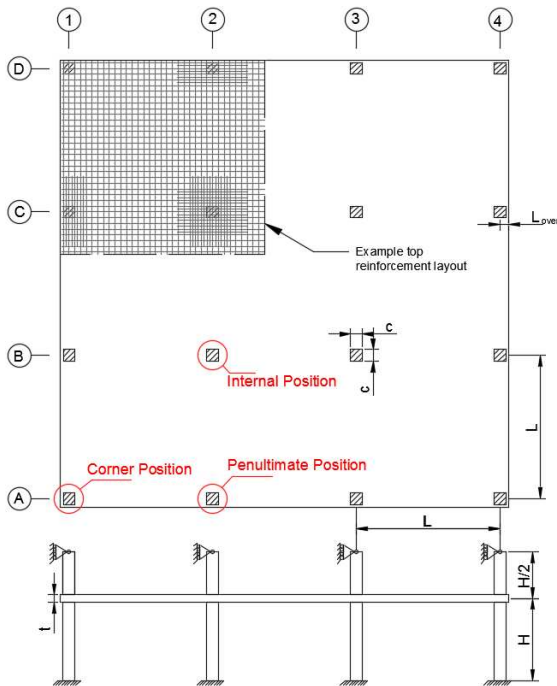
Plan and elevation showing labels, key column locations, typical reinforcement and grid markings
